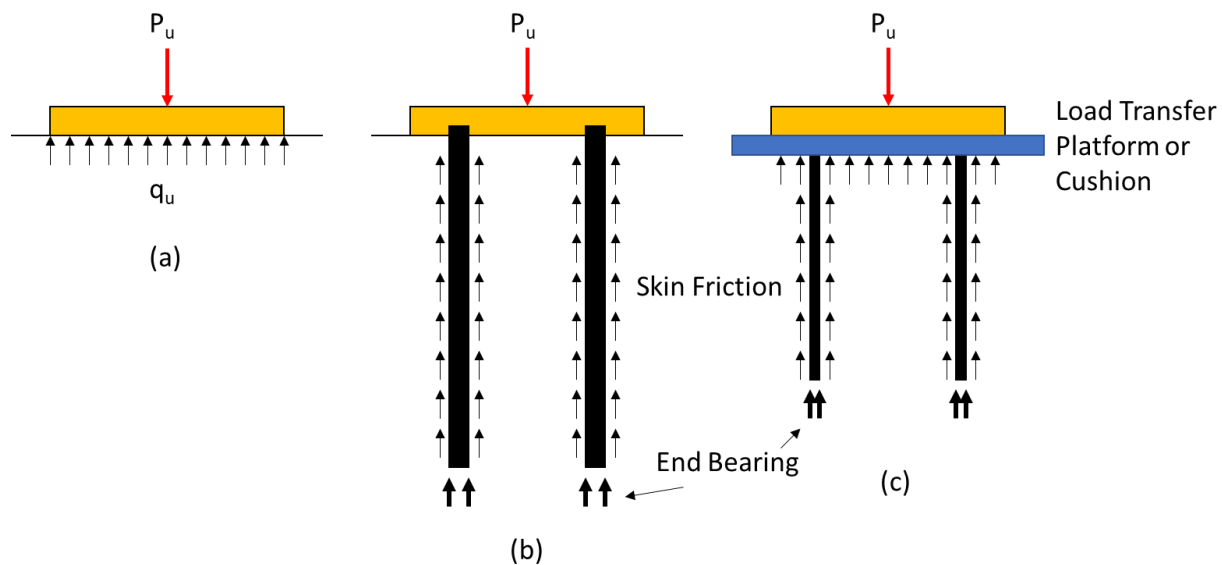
Typical foundation options: (a) shallow foundations (footings), (b) deep foundations (piles), (c) rigid inclusions.
